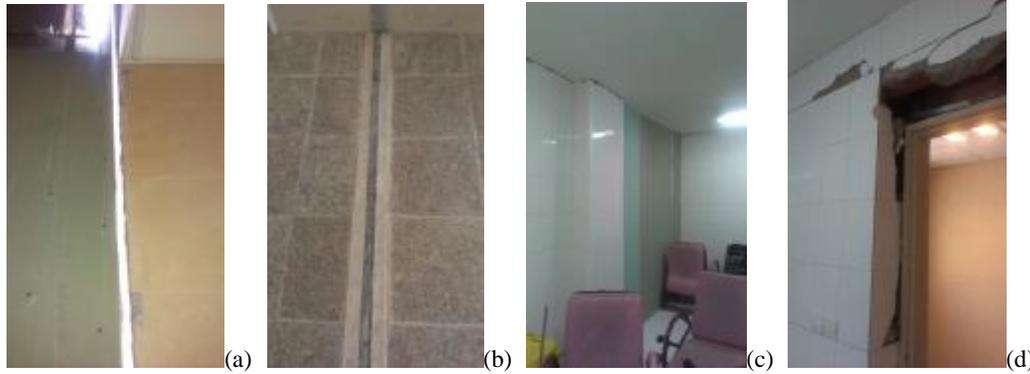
Non-structural damages to the Borazjan new hospital building. Rapid installation of new gypsum boards (a), and replacement of new mosaics at the separation joints (b) following the earthquake; detachment of partitions from the frames (c), and breaking and falling of tiles on some of the ground floor rooms (d).
